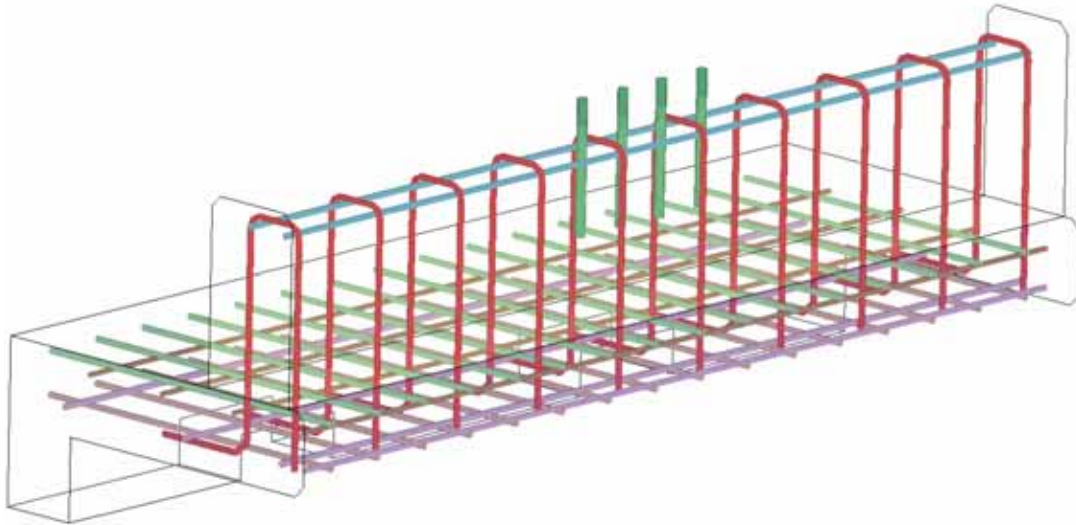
Steel reinforcement and anchor bolts for T4 bridge rail specimen with four-bolt anchorage and 254-mm- (10-inch-) wide parapet.
